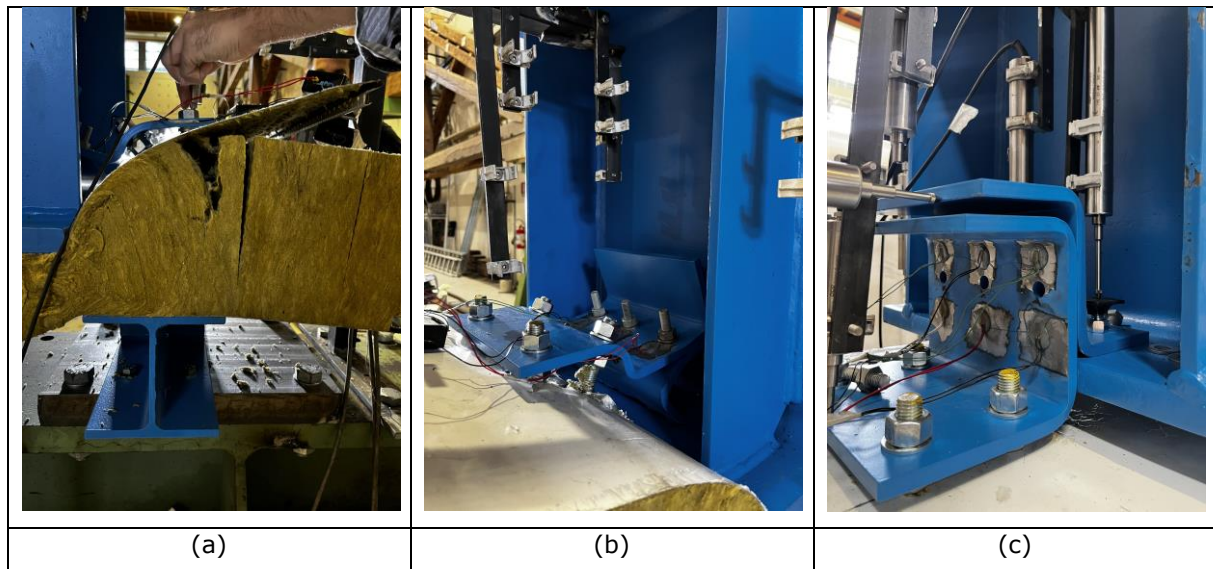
Detail 1 at failure: (a) sandwich panel in compression test; (b) plastic deformation of C and Z elements under compression force; (c) movement between C and Z elements subjected to tensile force.
